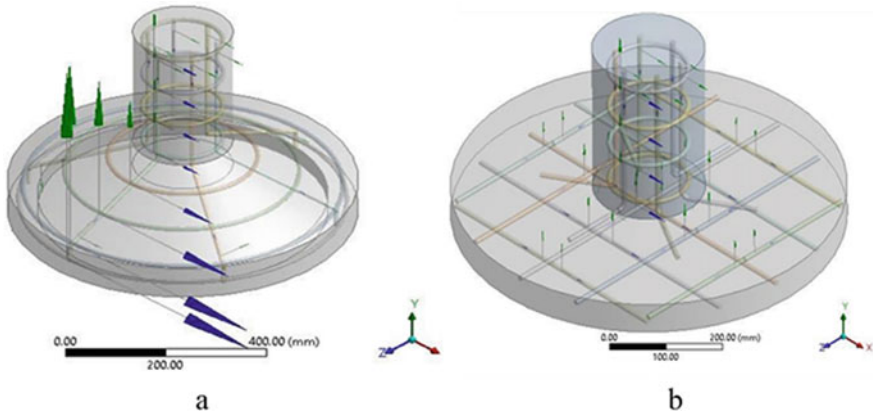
Finite element model of a conical shell foundation b circular flat foundation
